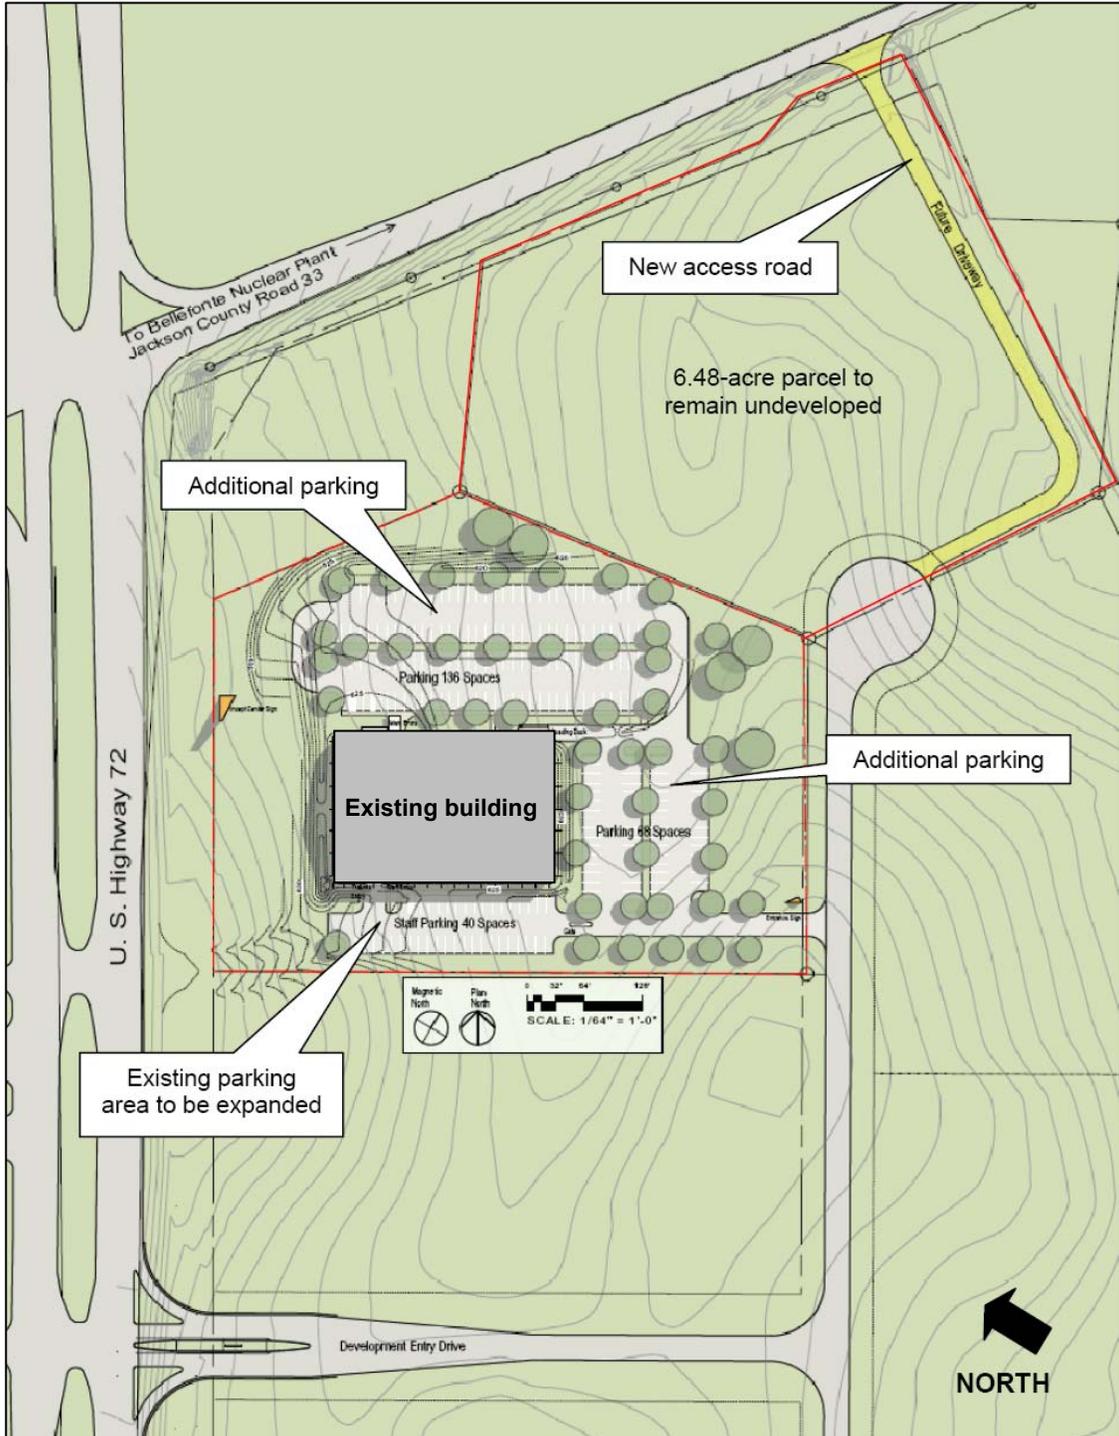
Plan View of the Proposed Training Facility in the Jackson County Industrial Park Near Hollywood, Alabama
